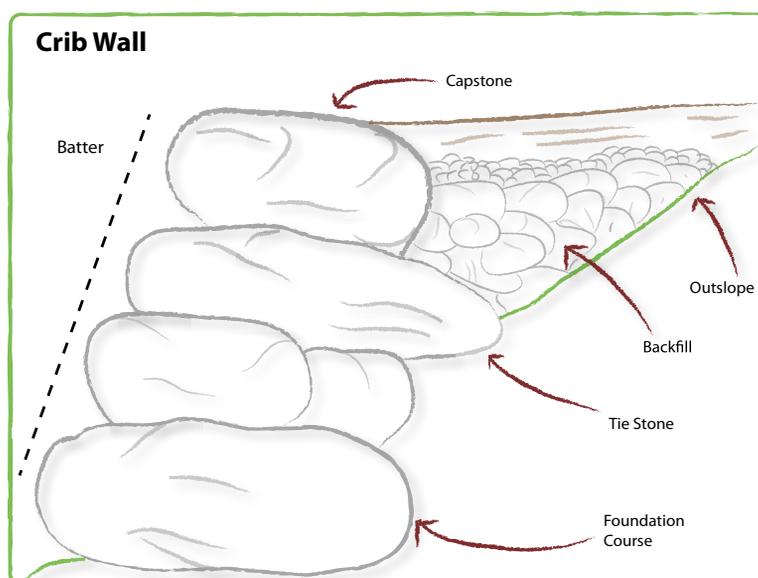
With expert supervision, constructing a crib wall is a satisfying job for seasoned trail builders and new volunteers alike.
